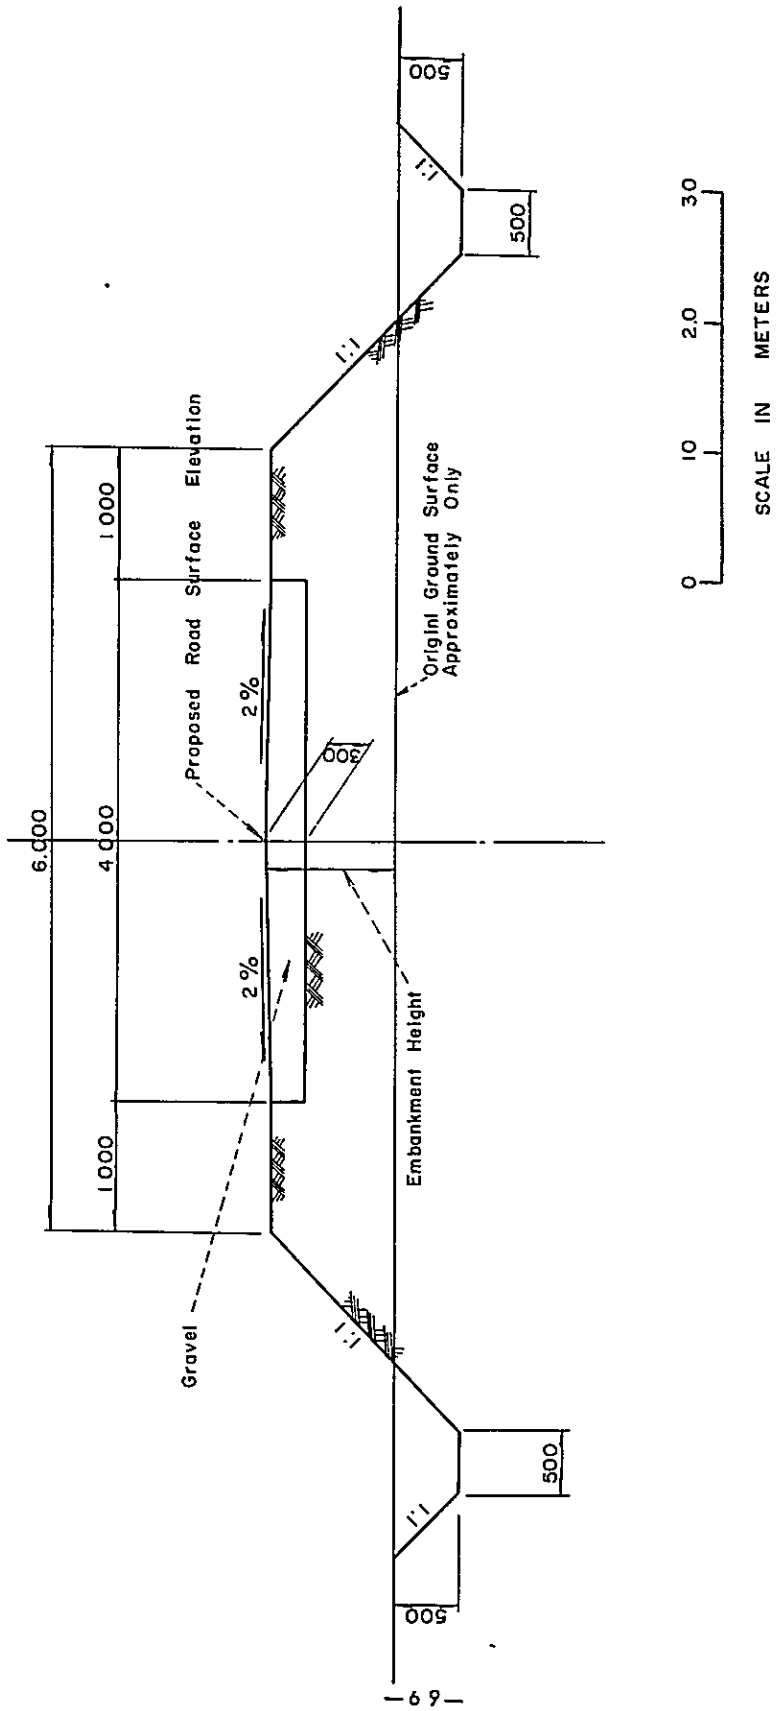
2.17 Typical Cross Section of Connecting Road
